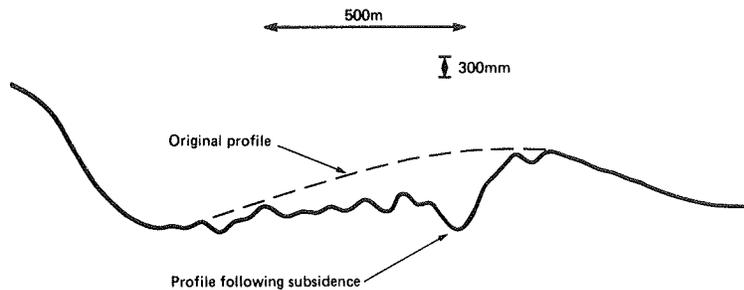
Measurement of subsidence profile on a continuously reinforced concrete pavement by the high-speed road monitoring system.
